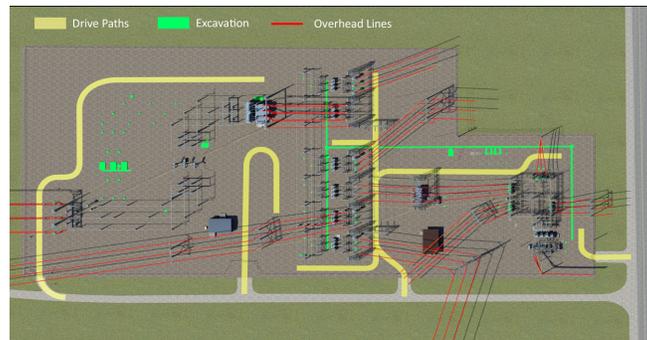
Routing of Hydrovac truck for excavating trenches and foundations
